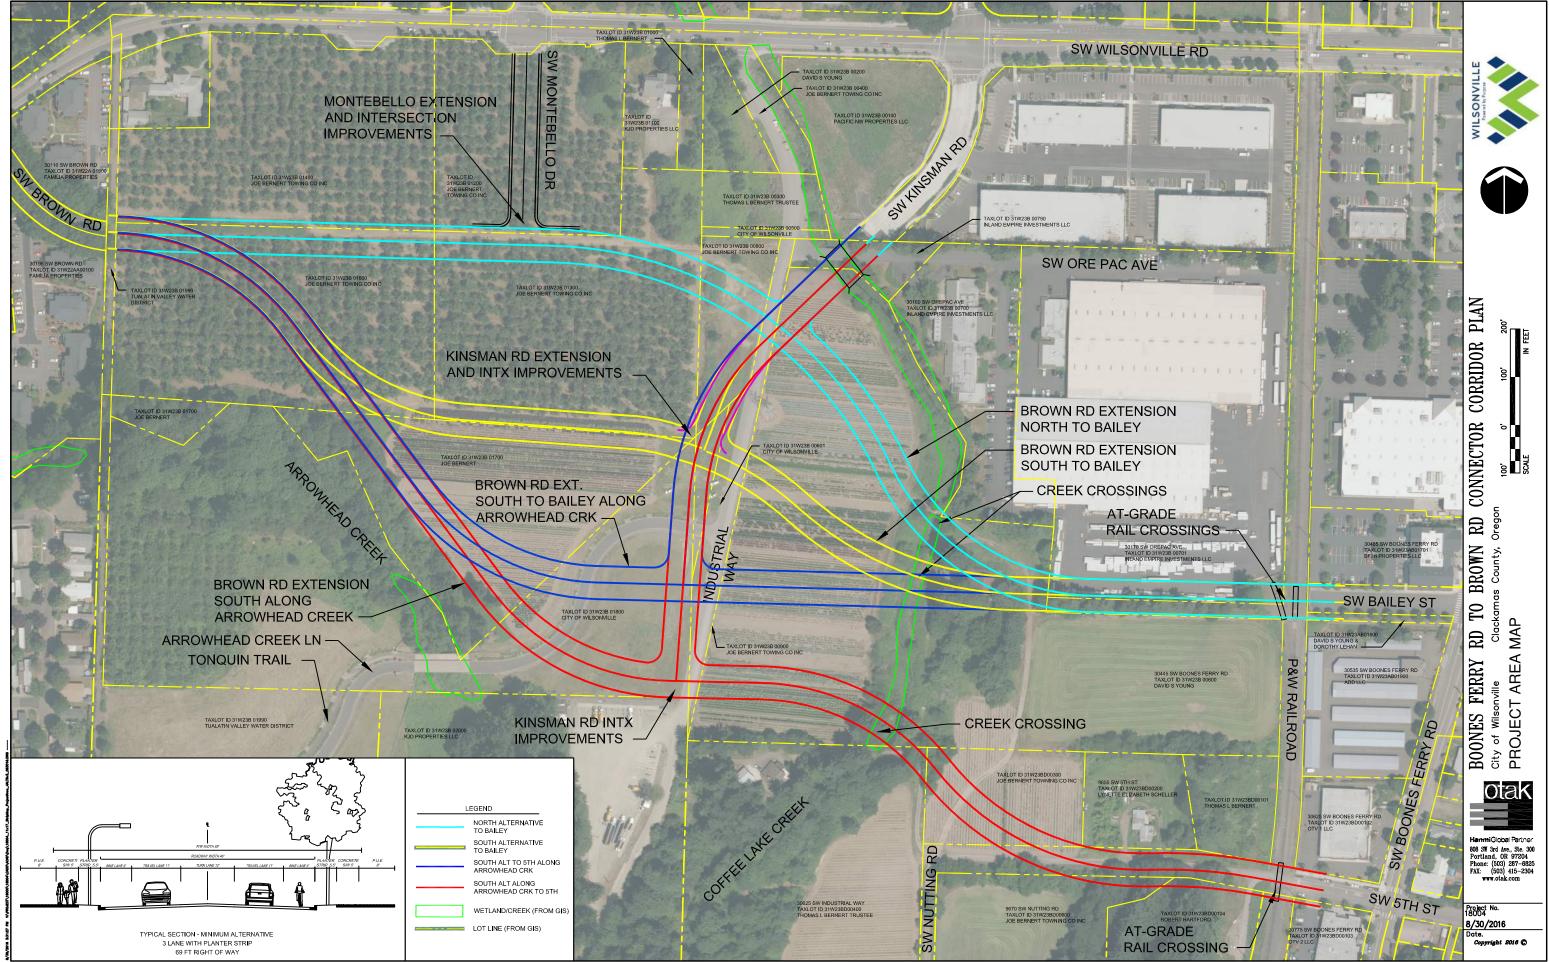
The Boones Ferry Road to Brown Road Connector Corridor project area showing the north and south alternative routes.
